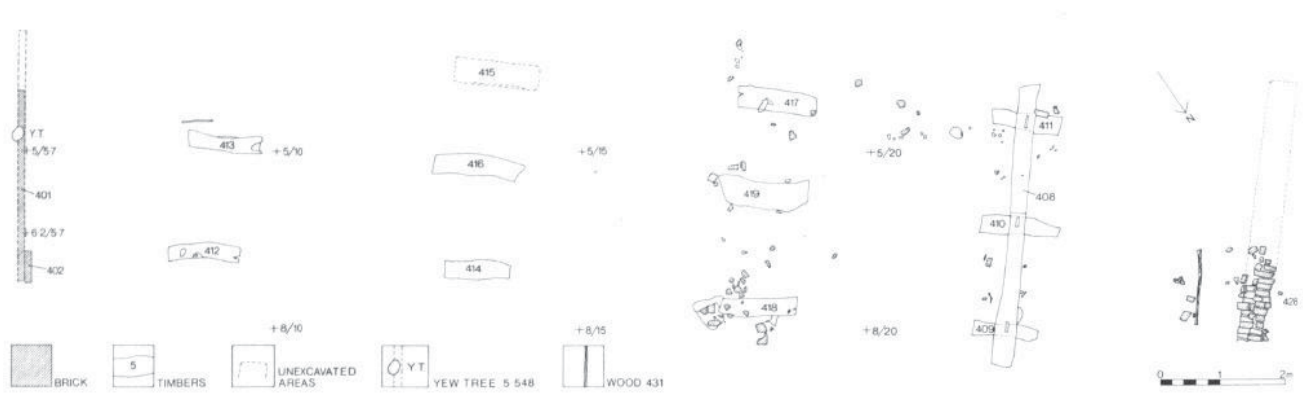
Excavation plan of the Five Arched Bridge, Painshill
